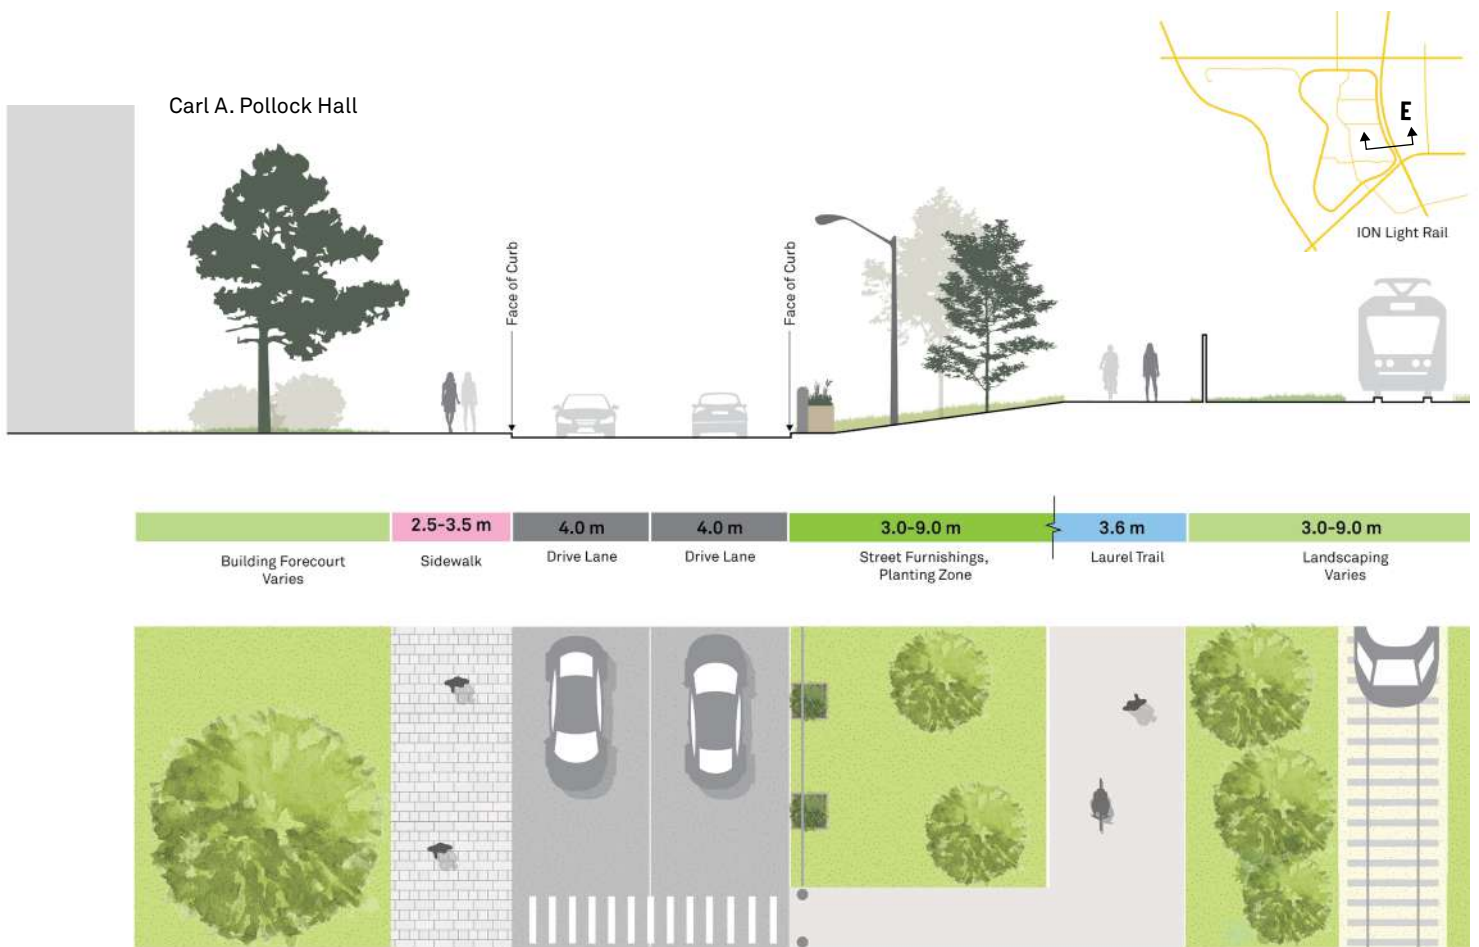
Section E. Existing condition of Ring Road (southeast edge).
